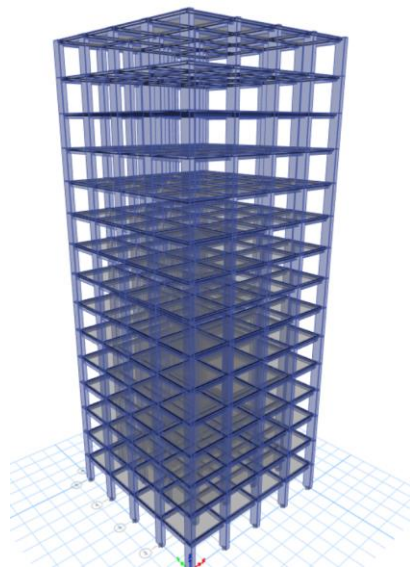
3D rendered view of Model-3 : Structure with Blade columns
